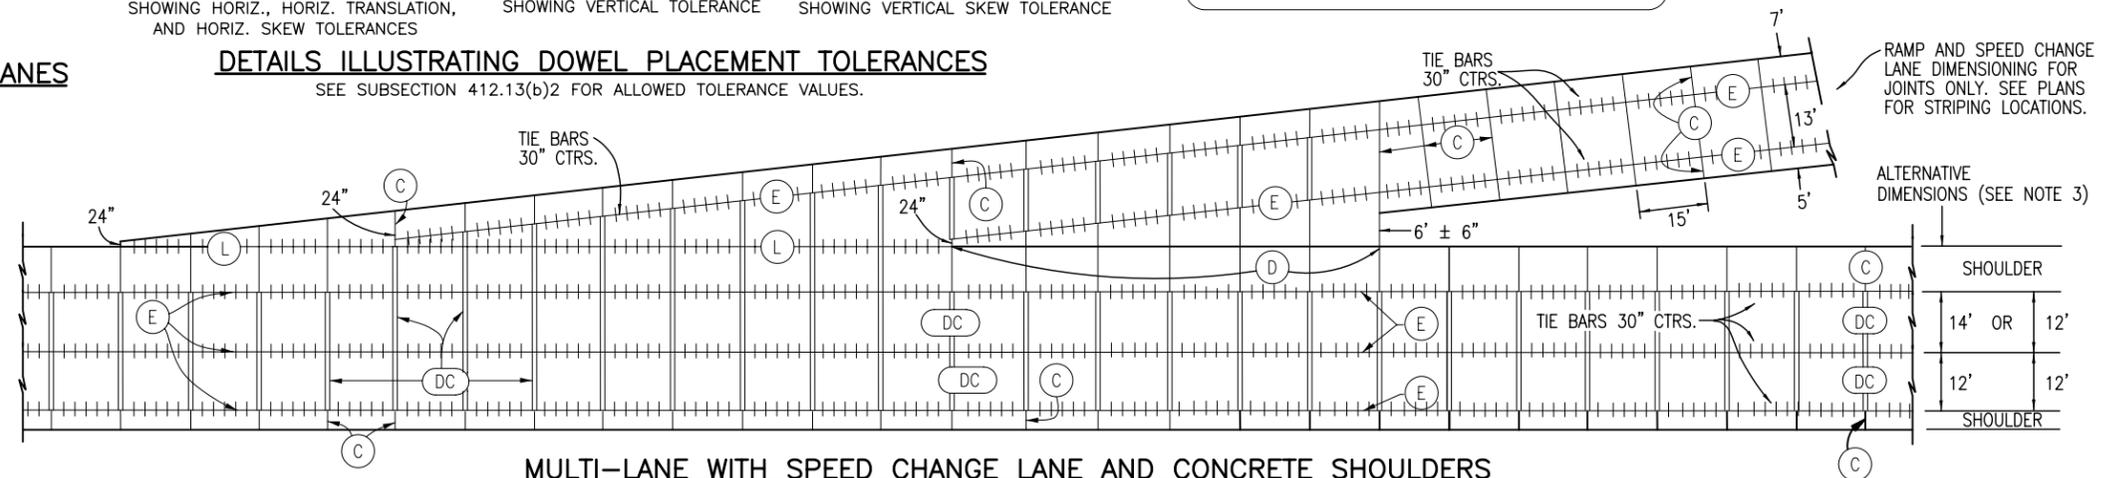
DETAILS ILLUSTRATING DOWEL PLACEMENT TOLERANCES
